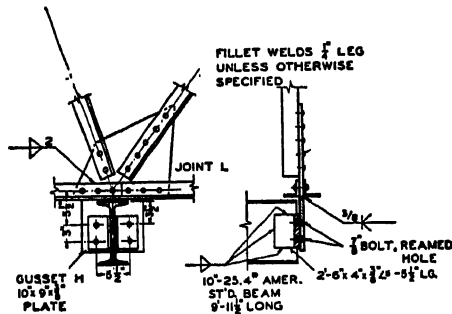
Detail of Joint L with Welded Gusset Plate.
